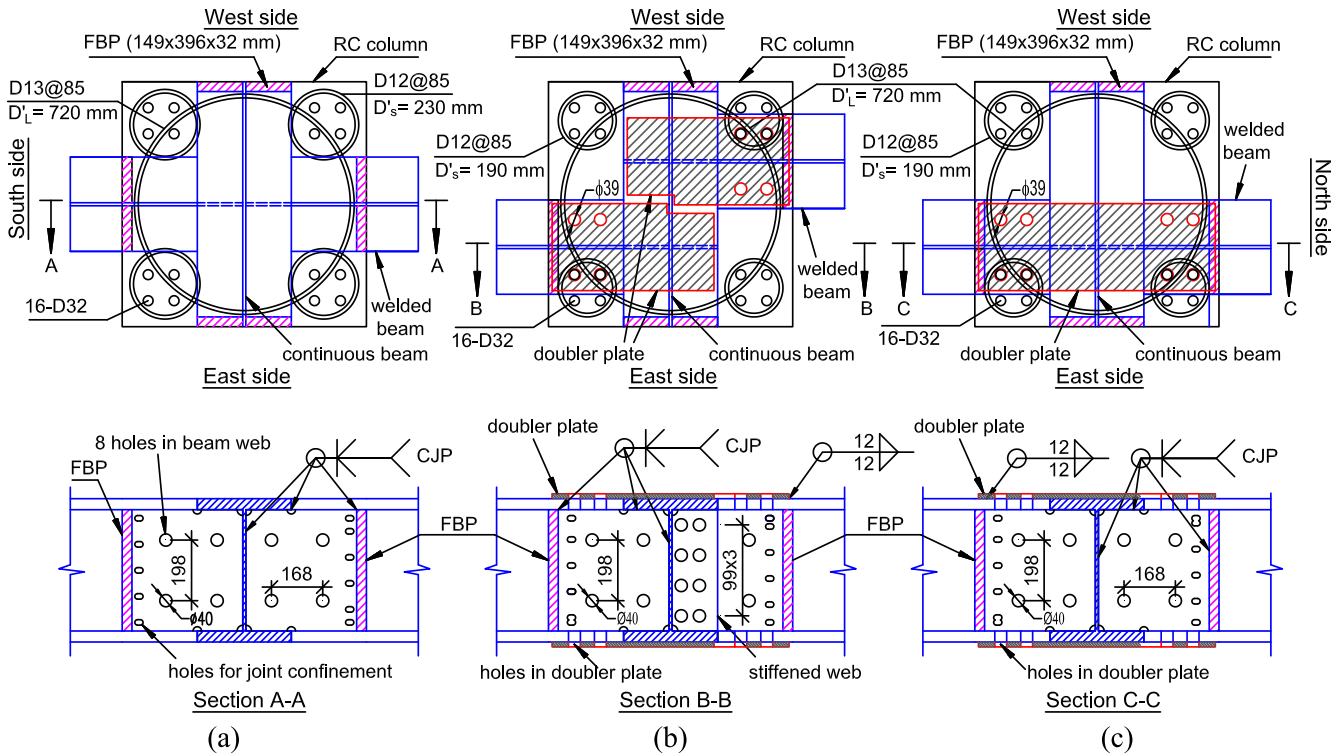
Design details of joint: (a) IHS, (b) IDEHS, and (c) ISEHS.
